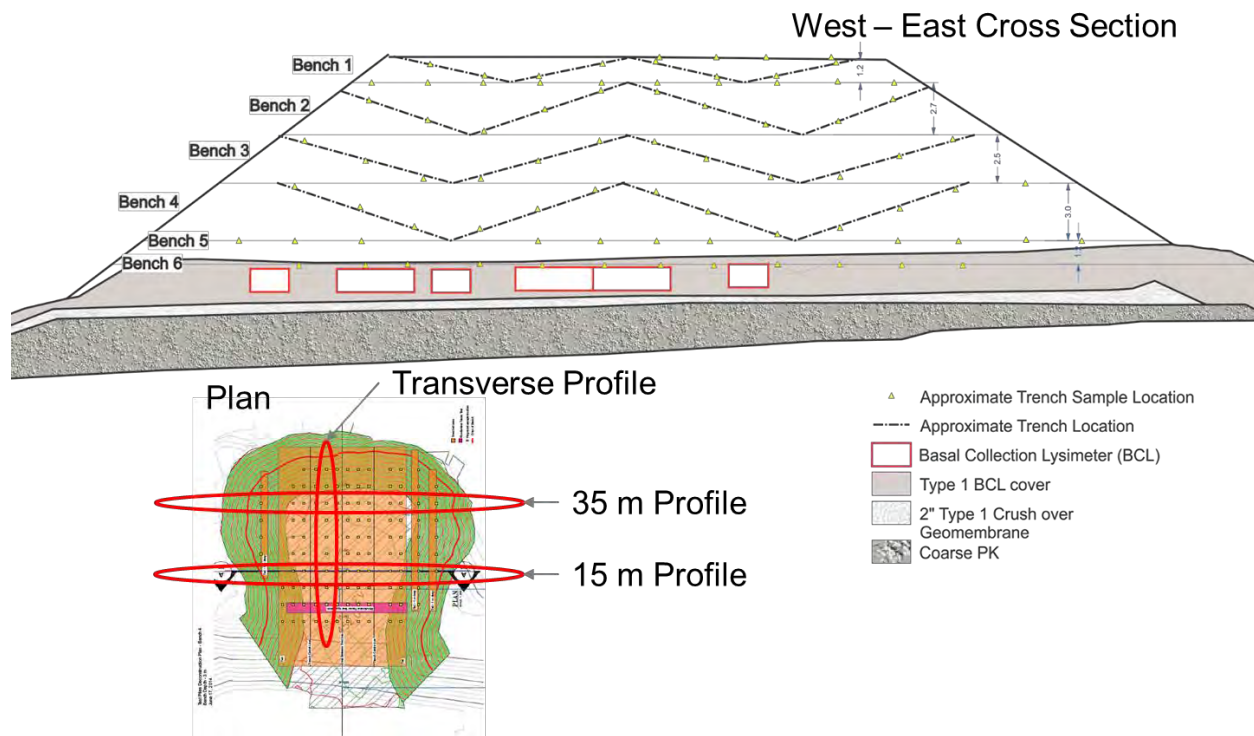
Cross-sectional and plan view of Type III test pile deconstruction samples.
